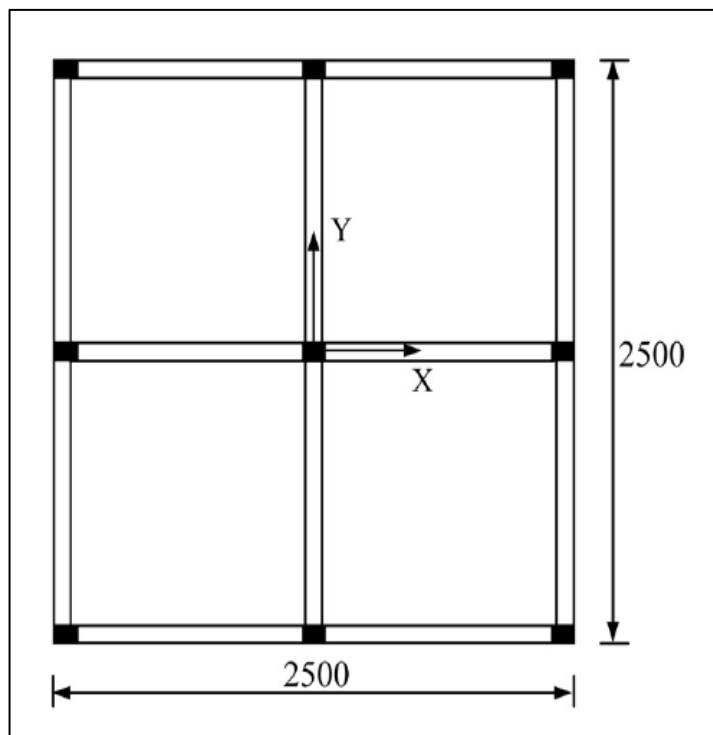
Plan of RC structure (Chetan et al. 2009)
